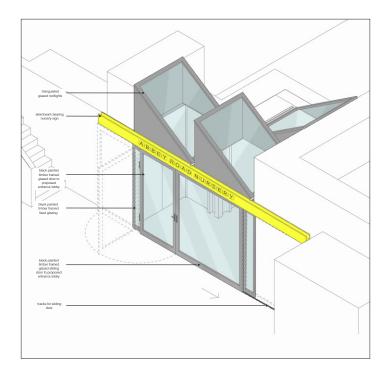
84-86 Abbey Road - Proposed entrance structure.
